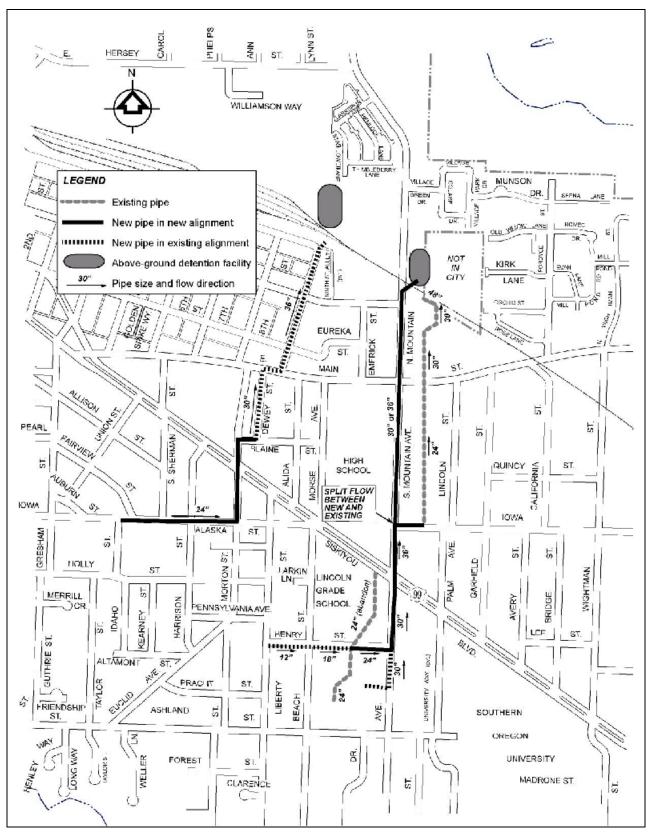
Improvement Alternative 1 for Beach/Mountain Basins
